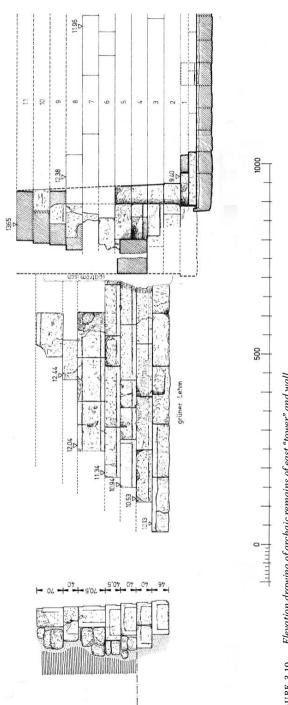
Elevation drawing of archaic remains of east "tower" and wall COURTESY K. HOFFELNER
